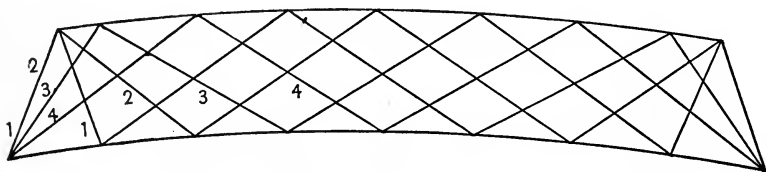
BENT GIRDER OF FOUR SYSTEMS.
